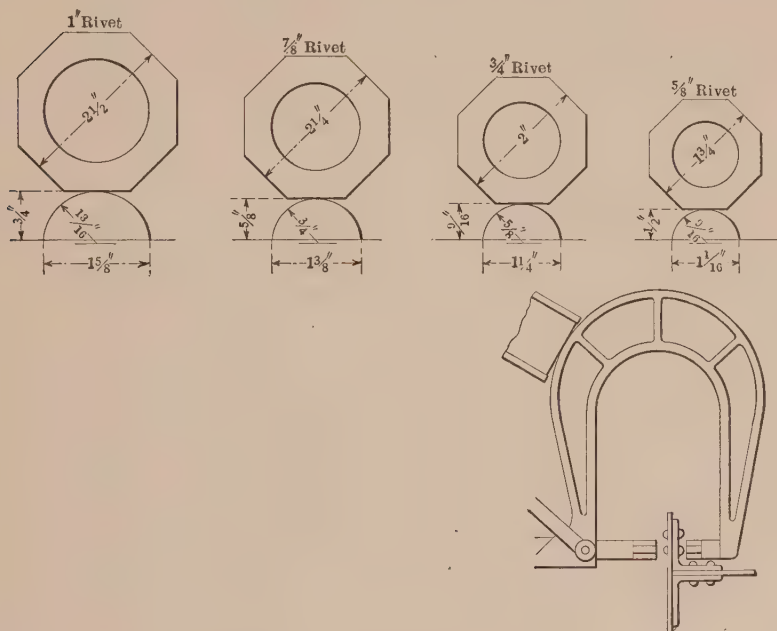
Sketches showing factors which determine minimum gage in angles, with rivets driven opposite.
